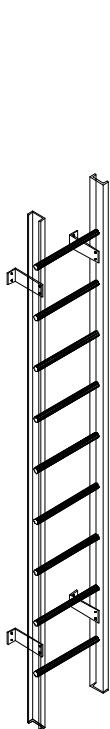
Ladder with two wall anchor brackets Fig. 2 Ladder with more anchor points
